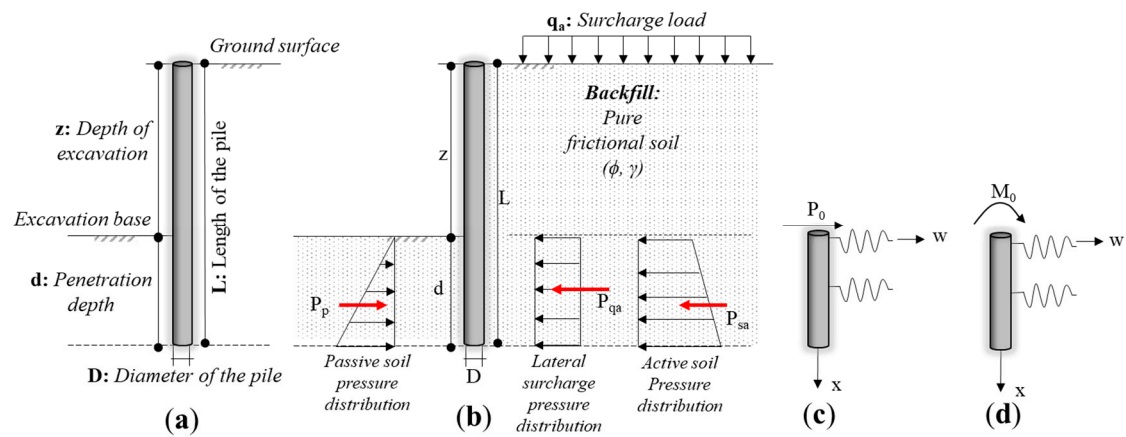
The cross section of a single soldier pile (a); Lateral forces (b); Application of beams on elastic soil assumption (c,d).
